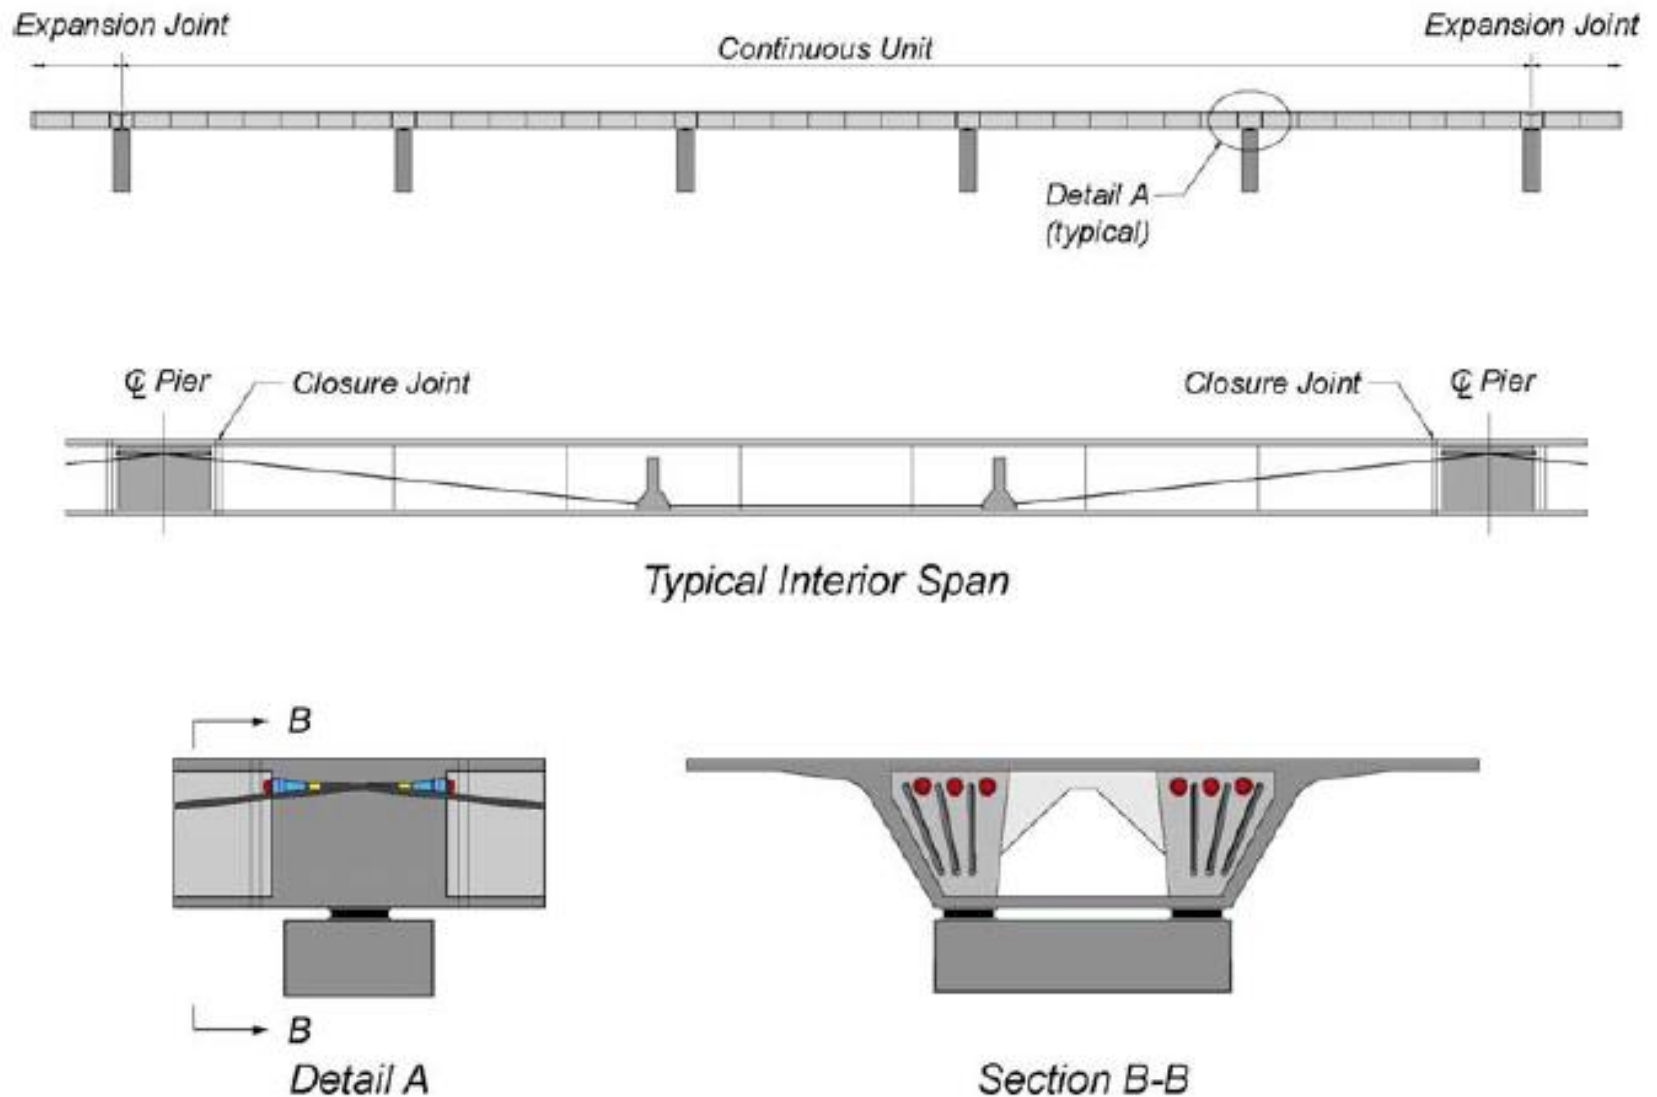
Interior Span Post-Tensioning for Span-By-Span Construction.
